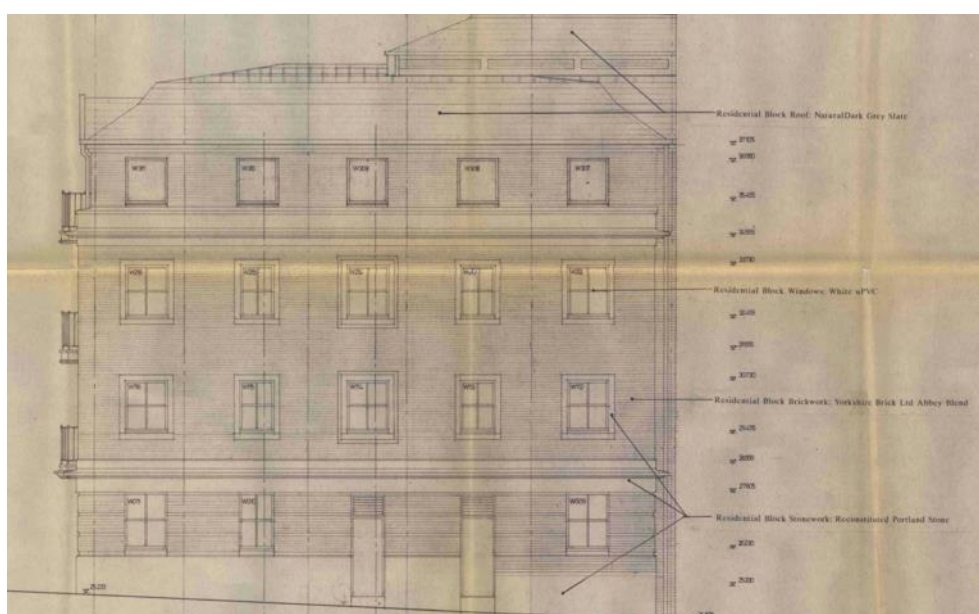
Approved Bloomsbury Court Elevation: application 8900364 of approved application 8800104.
